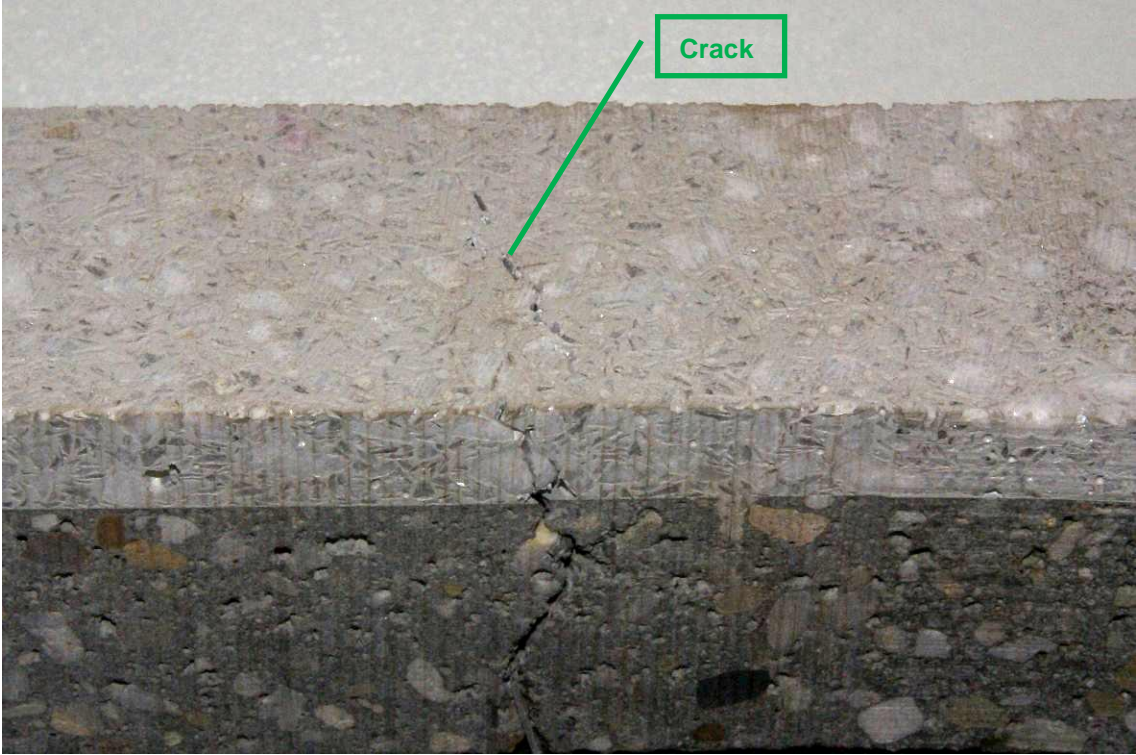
, Severe cracking of the terrazzo floor after 3 hours.
